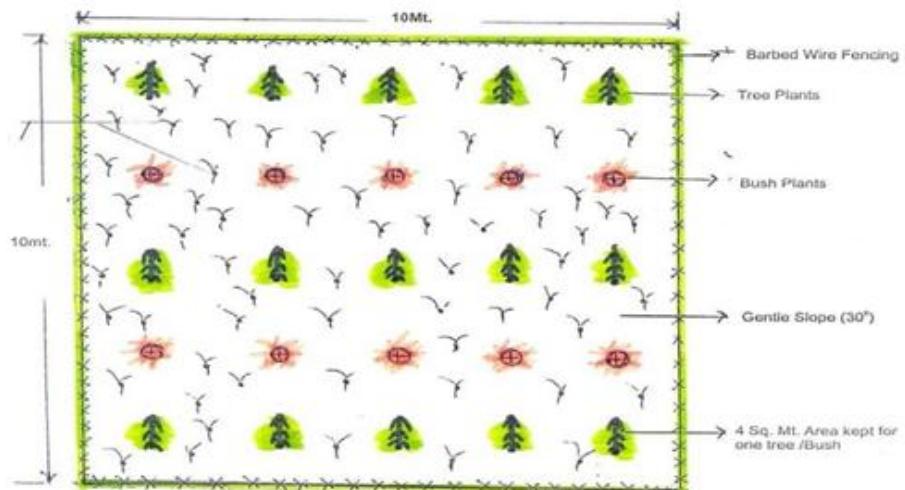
Shrub and Tree Planting (Source: Road side Bio-engineering , Site Hand Book, John Howell)
